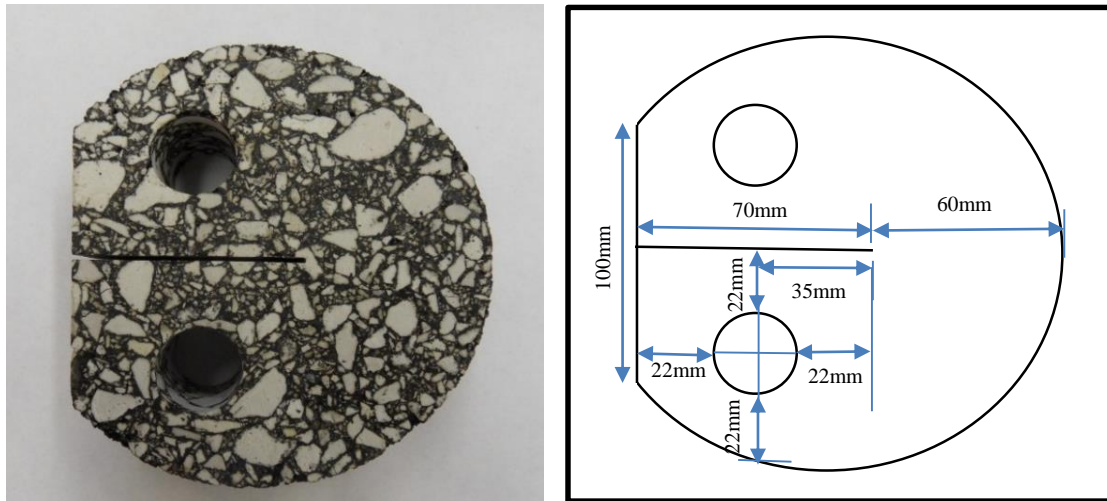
Proposed robust DC(T) geometry and dimensions.
